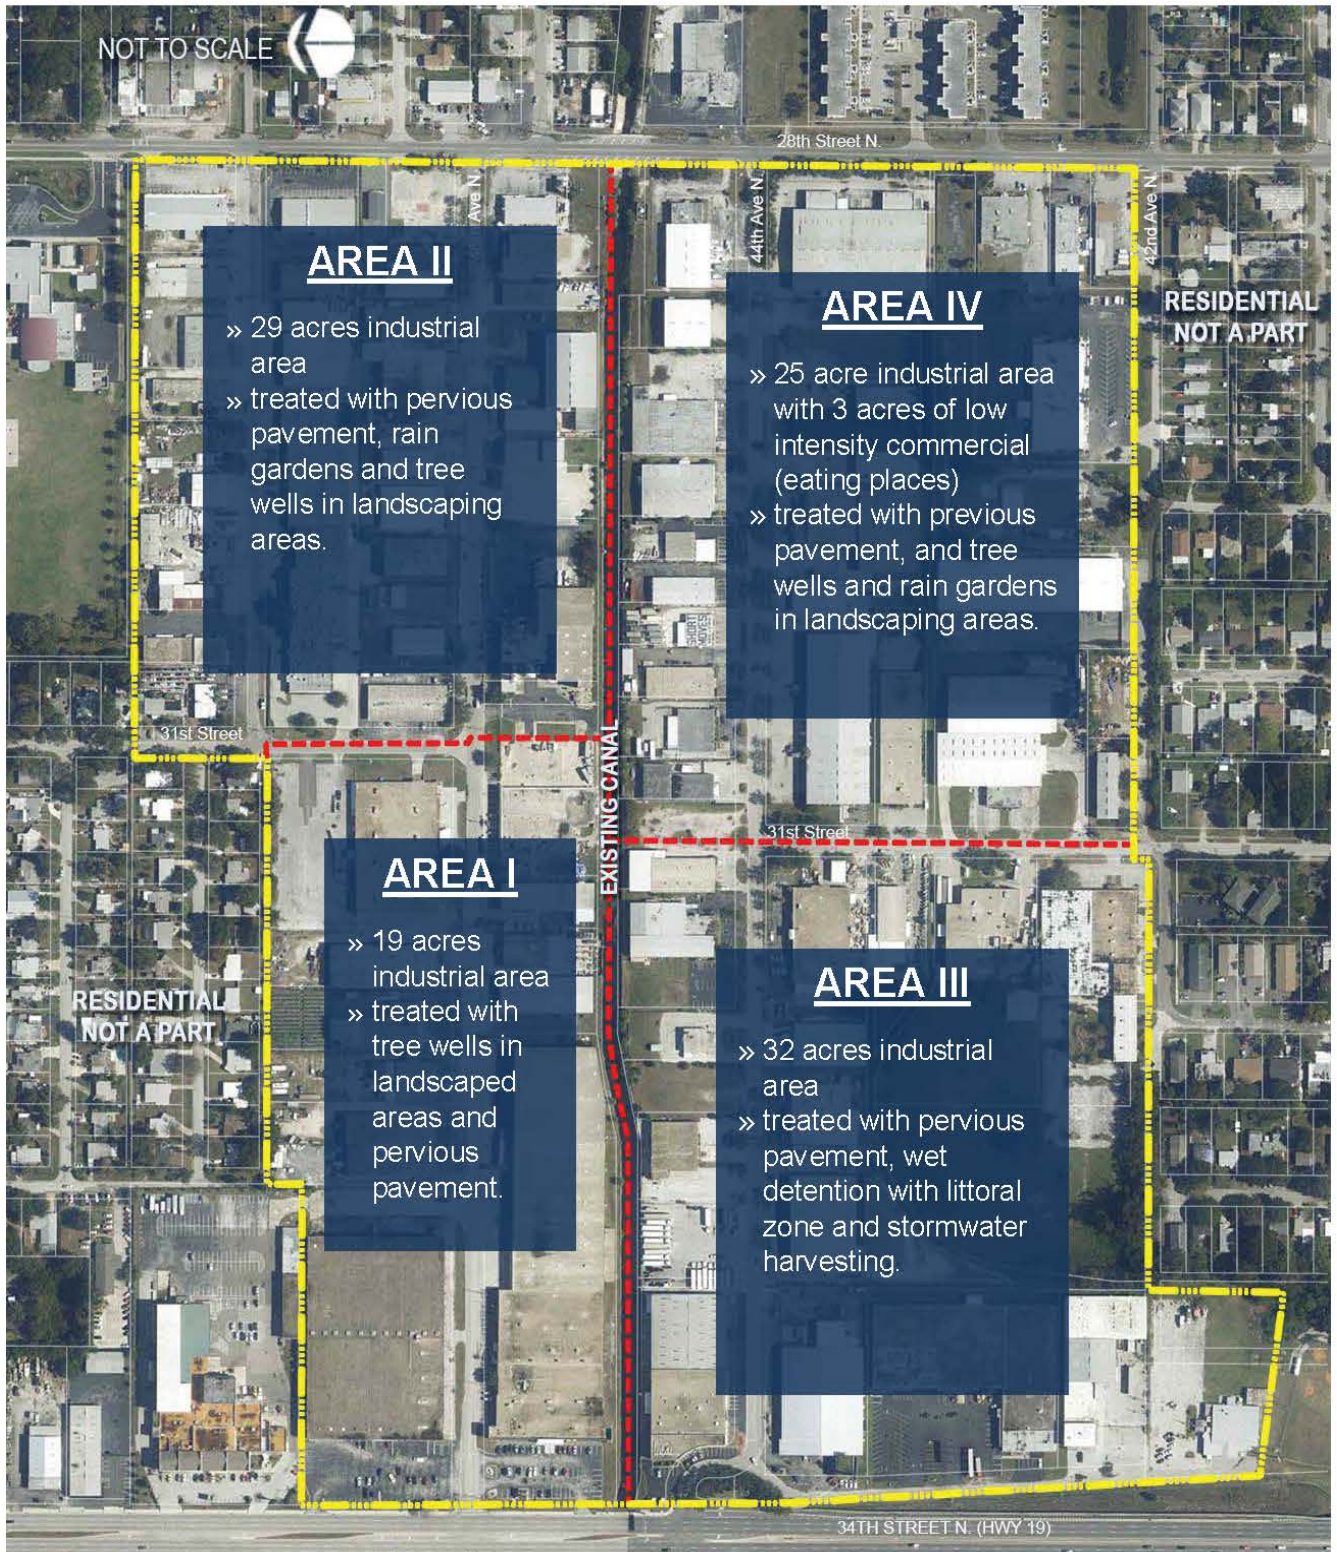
II – Conceptual District Stormwater Plan (NTS)
